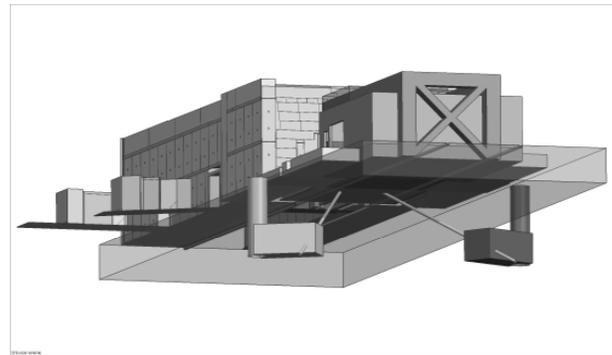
Two neutron flight paths from the TA to experimental halls located beneath the thick floor slab.
